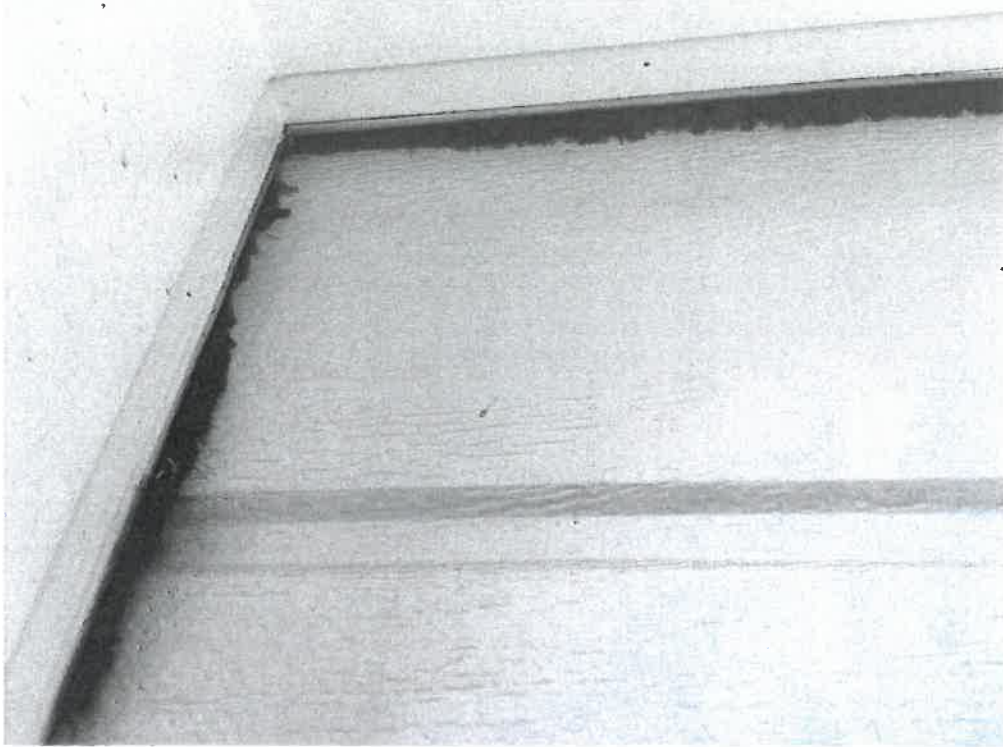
Willatook-Warrong Road Warrong 3282 sec137b report
